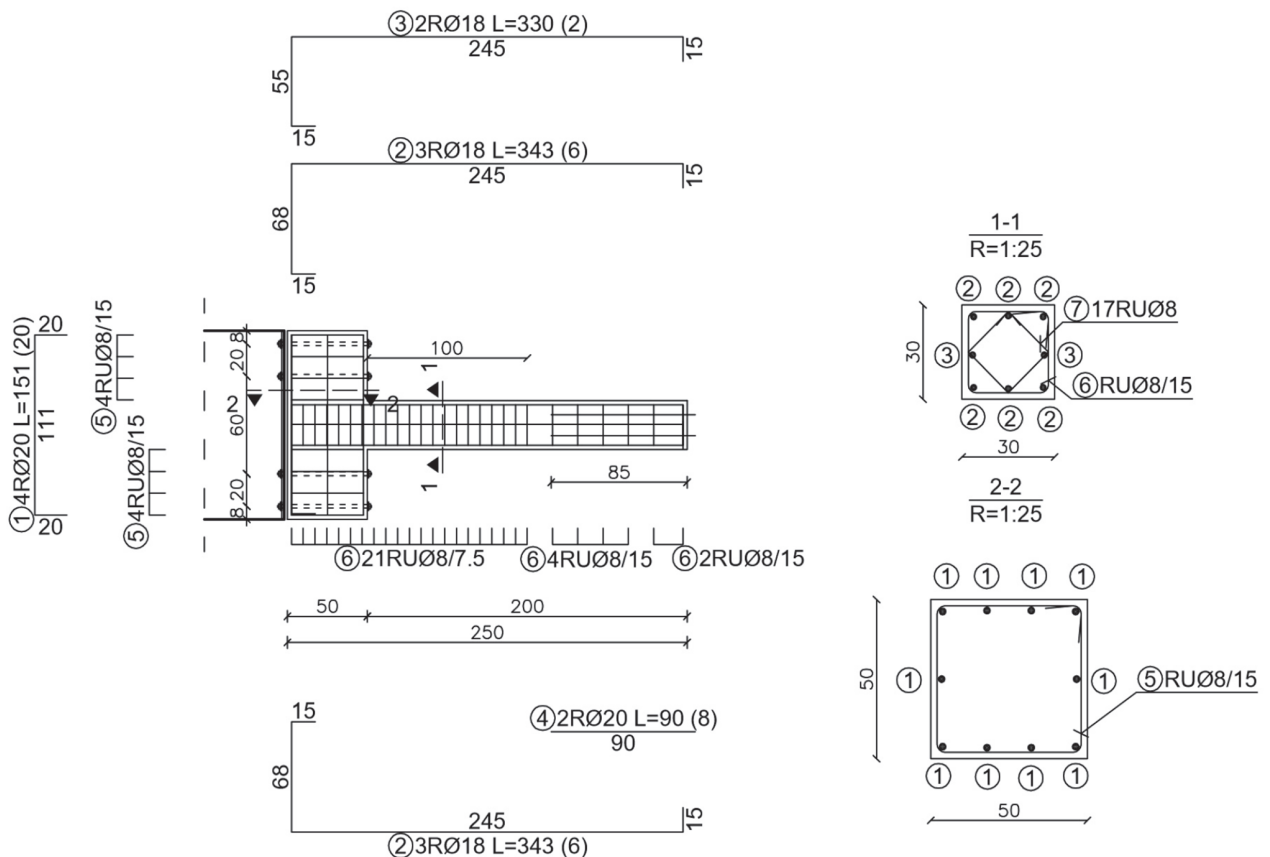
Detail of geometry and reinforcement of column models (Model M1)
